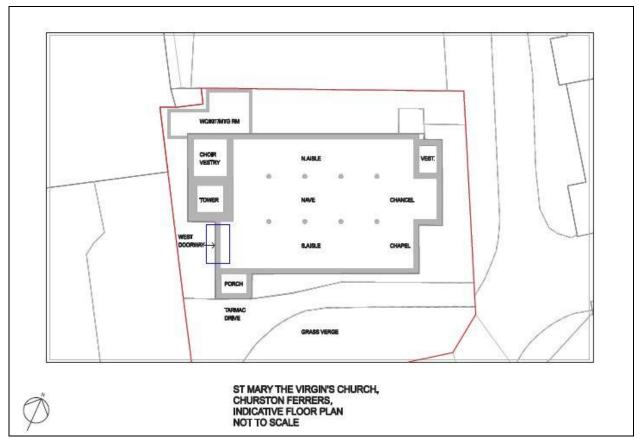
Site plan showing location of the West Door (By Apse Architects).
